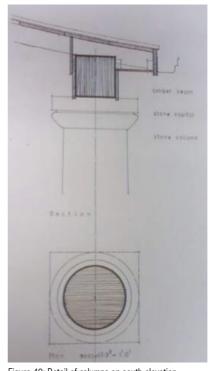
Detail of columns on south elevation [Source of all above images: Hanly *et al* n.d.]
